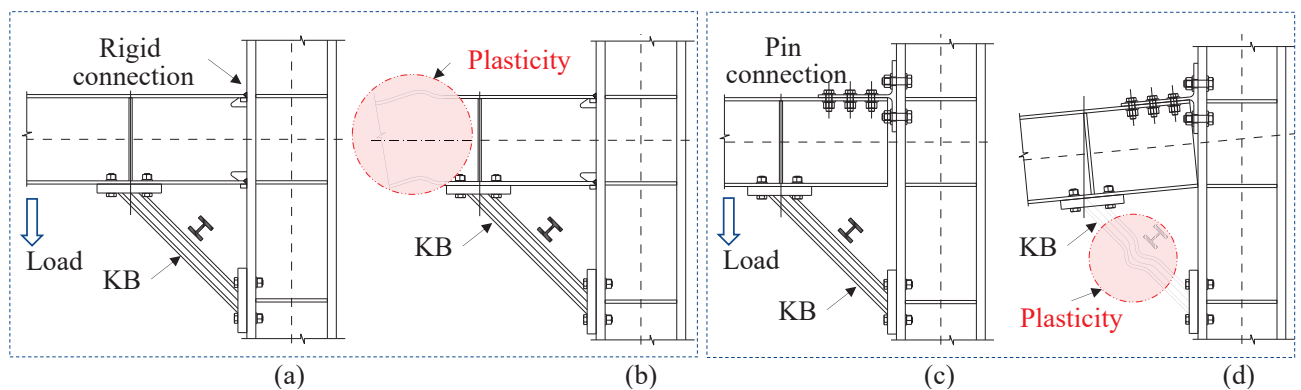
The configuration of strengthened beam-to-column connections (AISC).
